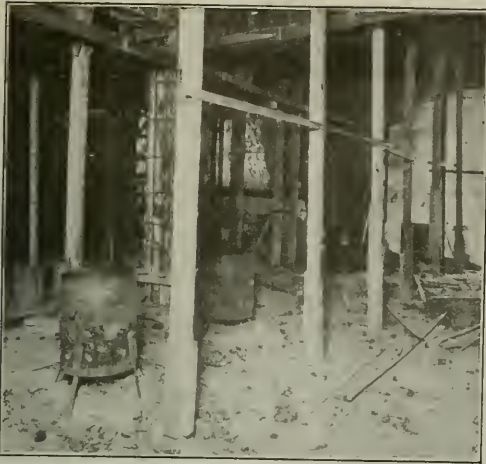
INTERIOR OF BUILDING, SHOWING SALAMANDERS HEATING NEW CONCRETE FLOOR ABOVE
